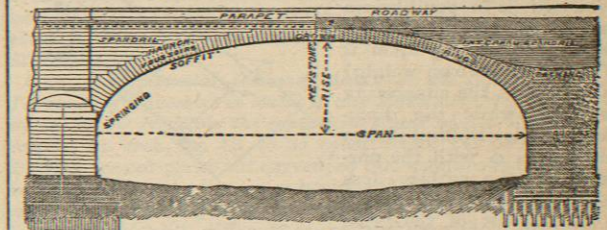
Half Elevation and Half Section of Arch of London Bridge.
